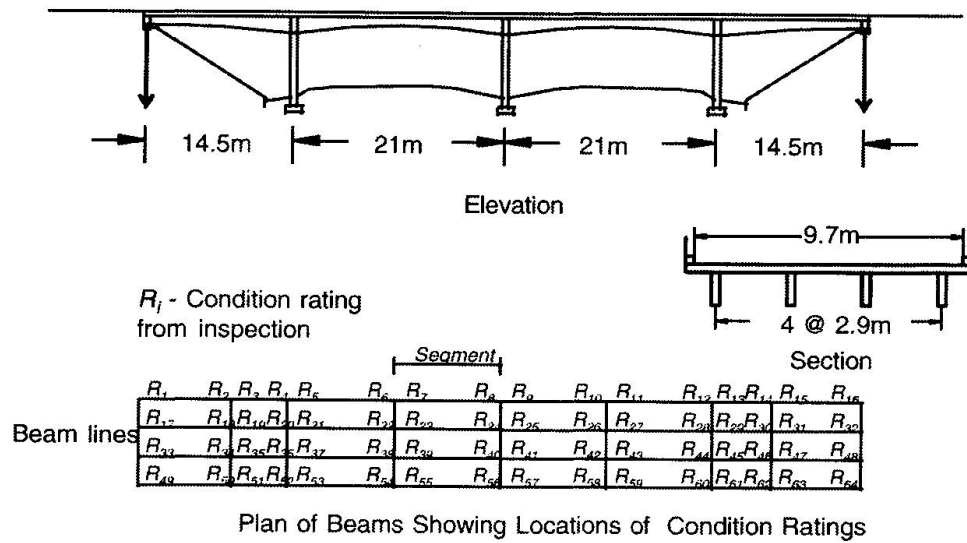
Beam Segments for Reinforced Concrete Bridge
